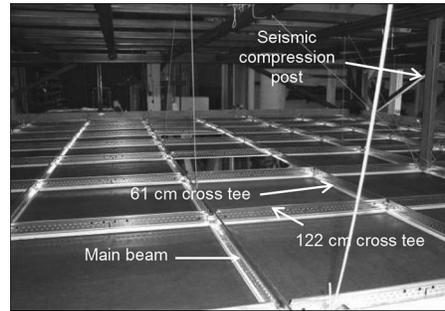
Test fixture mounted on the simulator at the University at Buffalo.
